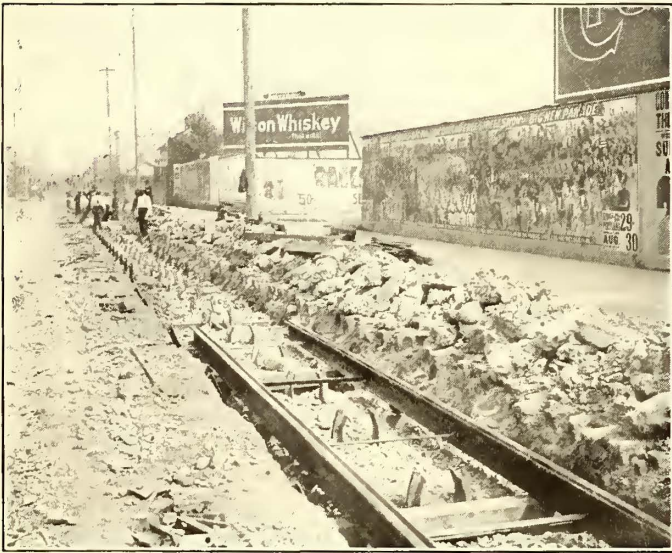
NORTH FIFTH STREET, PREPARING TRENCH OF OLD CABLE TRACK FOR NEW RAILS
